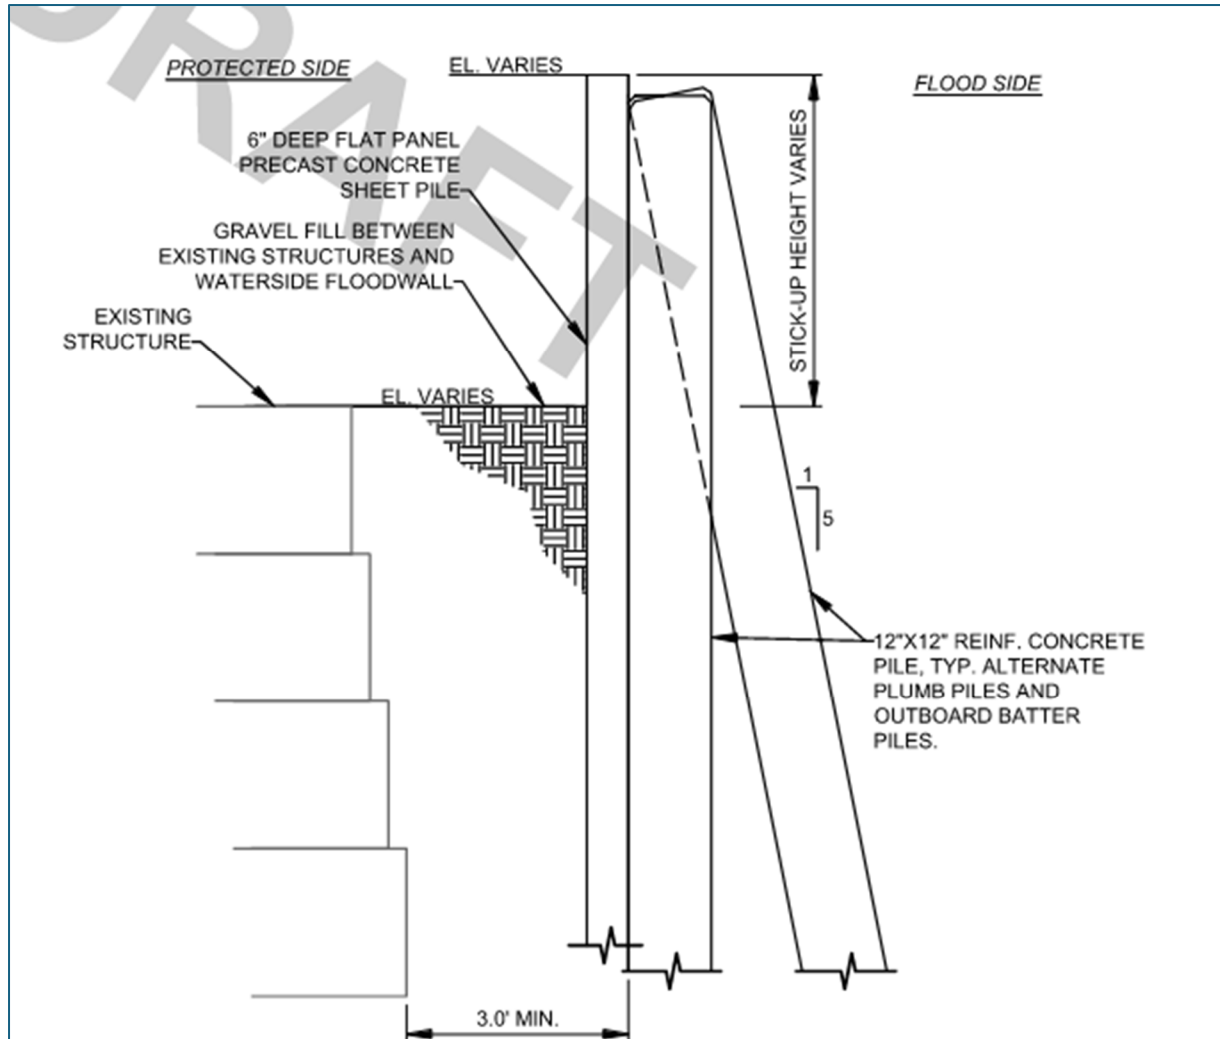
Proposed Waterside Wall with Precast Concrete Panels
